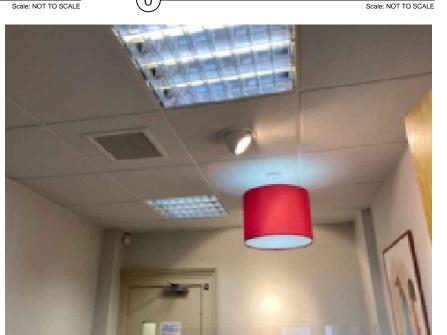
MEETING ROOM 3 Scale: NOT TO SCALE
